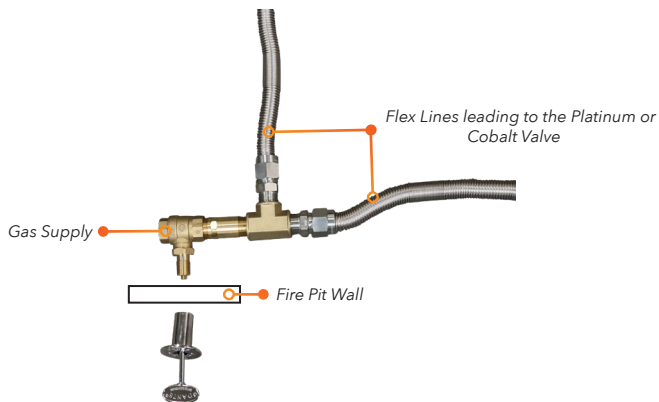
Connecting the Flex Lines from the Platinum or Cobalt Valve to the Key Valve
